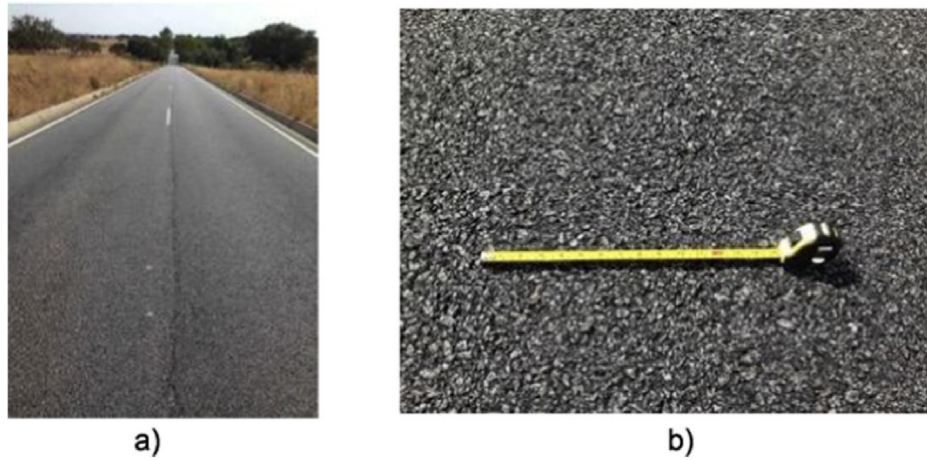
General (a) and detailed (b) views of the prevailing pavement condition after 8 years (reprinted from Ref. [137]).
